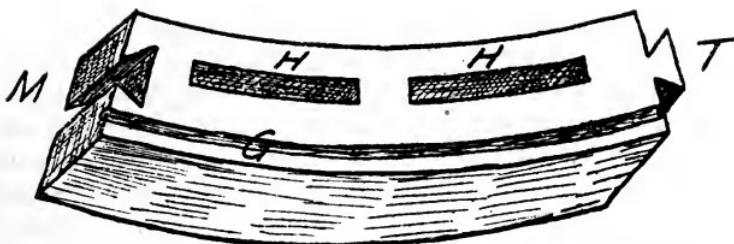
Illustrates a type of concrete block used in silo construction. H H are holes left in blocks. T and M are dove-tailed tenon and mortise so made that blocks interlock when laid on the wall. G is a groove made in block to imbed iron rod for reinforcing the wall.
